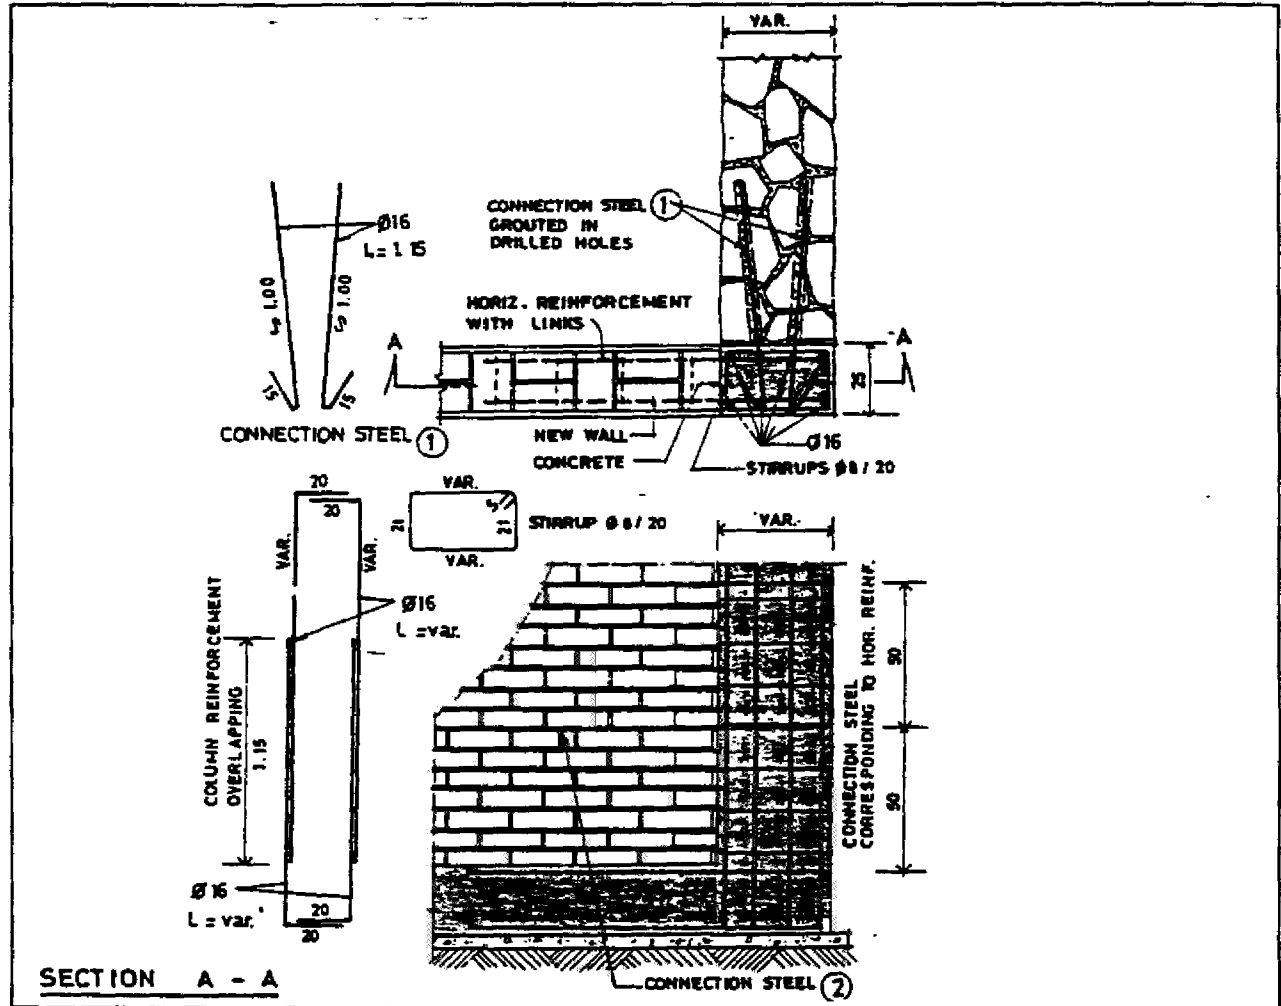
Connection of New and Old Walls (Corner Junction). [1]
